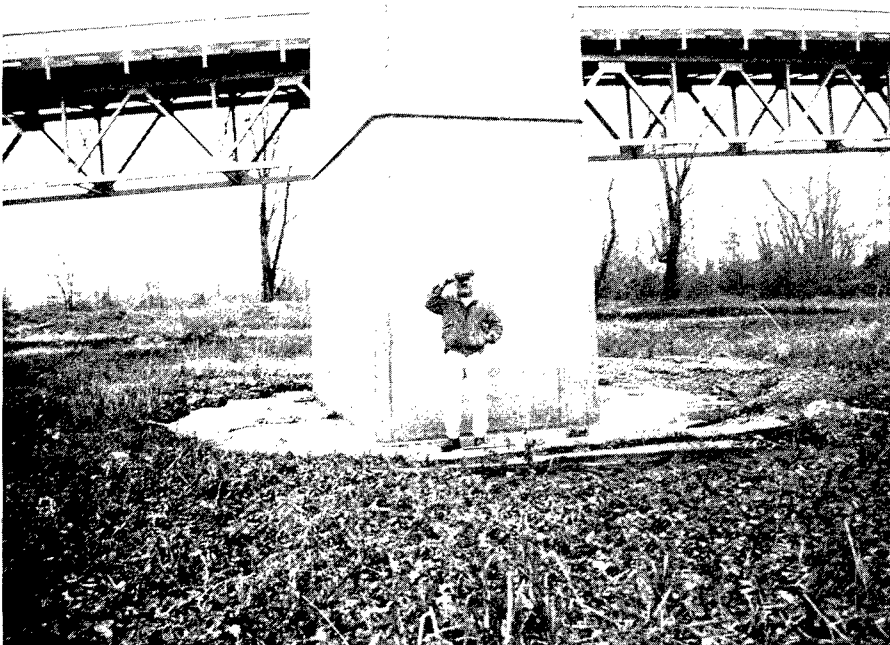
Railroad bridge pier (upstream from U.S. Highway 159 bridge) protected from Missouri River floodplain flow by wide foundation, near Rulo, Nebraska.
